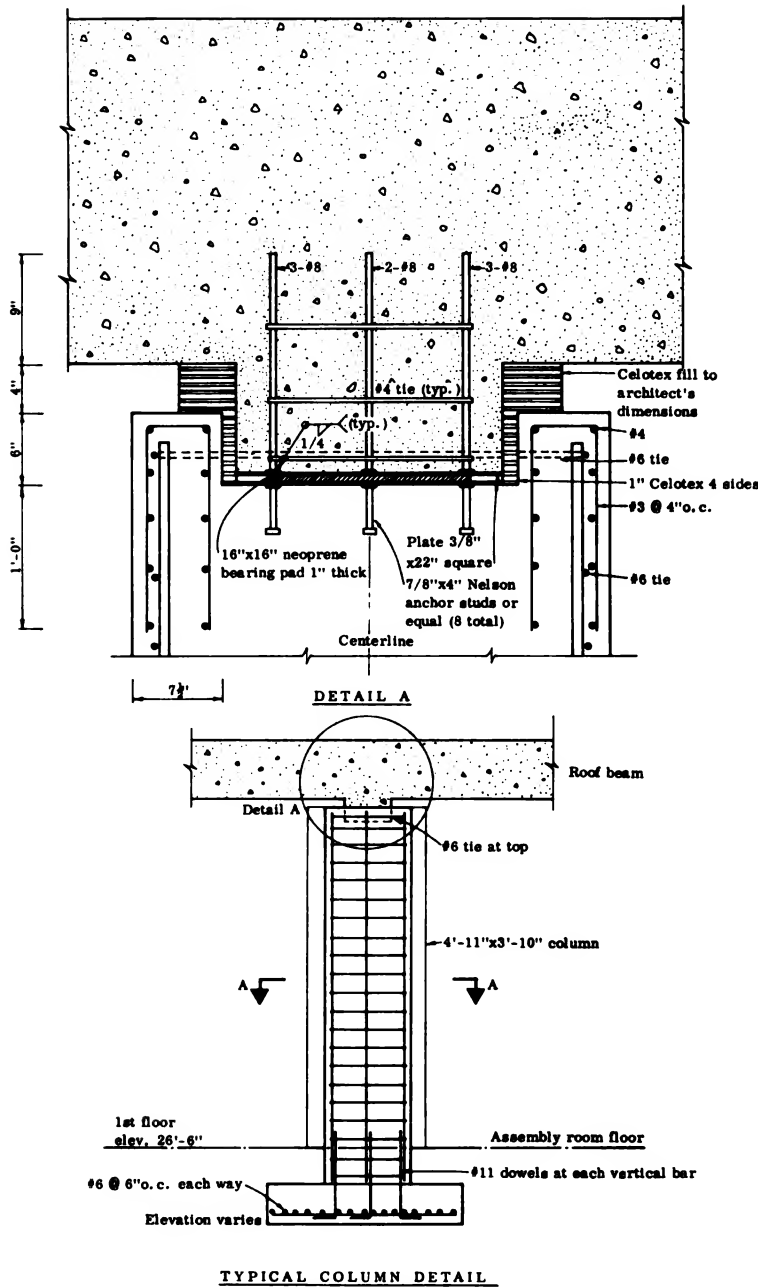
Olive View Hospital, assembly building. Details of exterior column and masonry wall connections.
